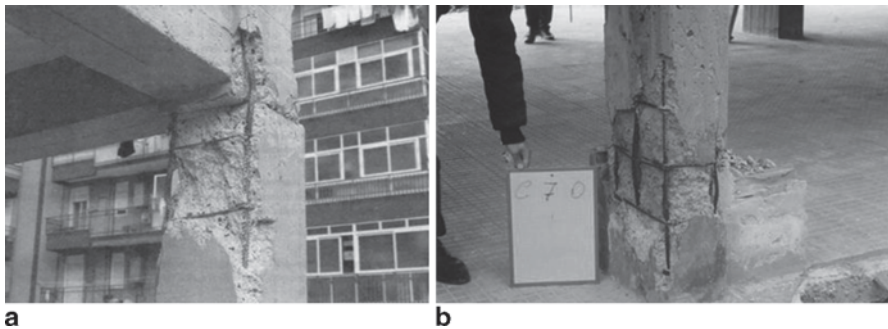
Typical damages occurred on buildings. a Damages on beam and. b Damages on column
